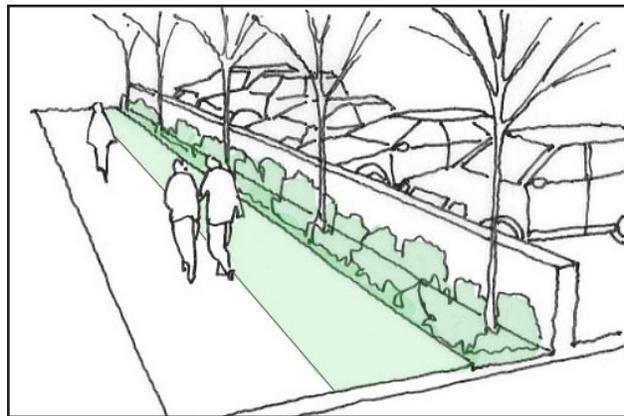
d.2 (2): Parking lot landscaping and masonry wall screen
